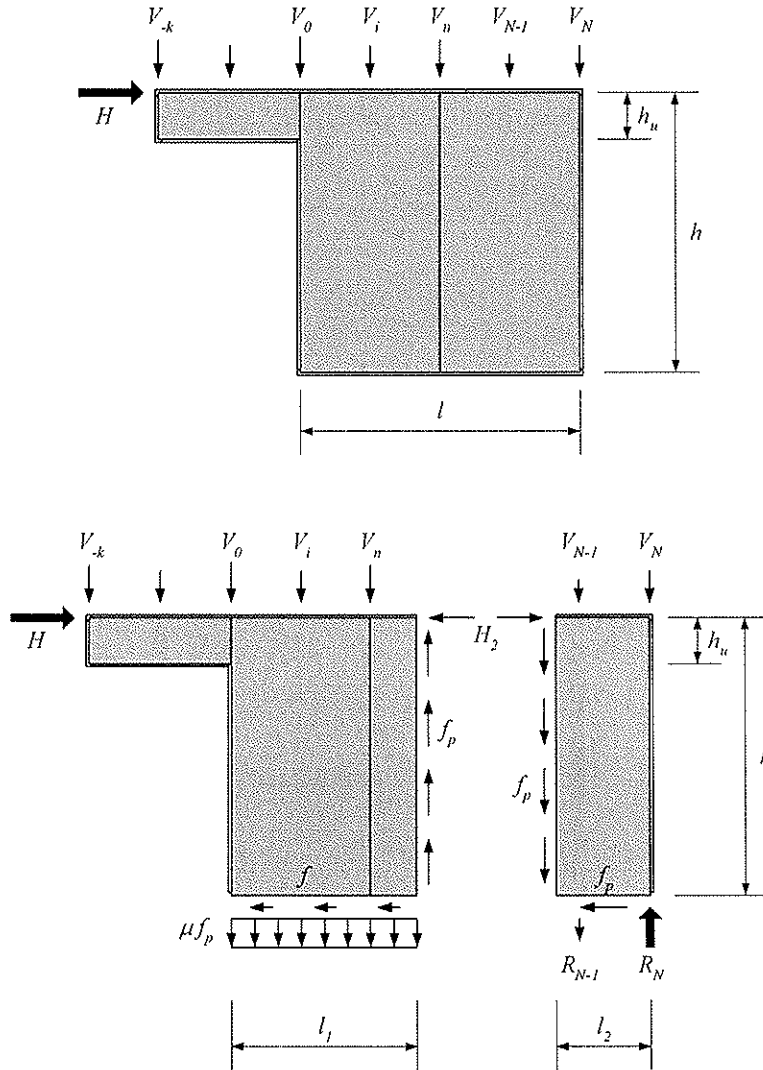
Forces acting on a wall diaphragm with fully anchored bottom rail but without tie-downs. The plastic capacity has been attained in the vertical section shown.
